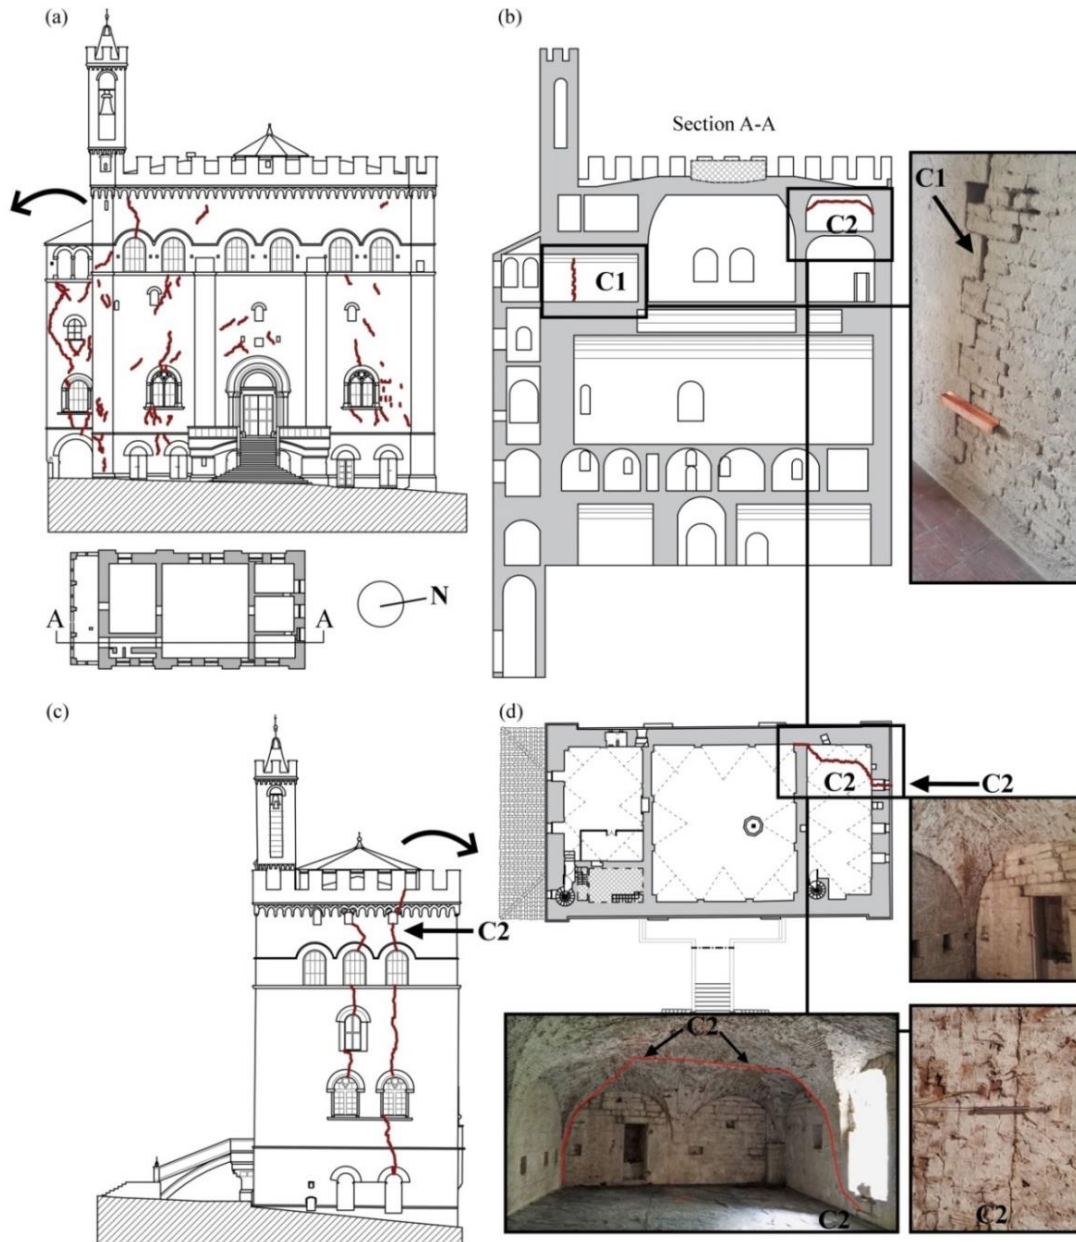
Structural damage of Consoli Palace: cracks of the East façade showing the possible overturning mechanism of the loggia towards South (a), section A-A of the Palace showing the 1st and the 2nd major cracks, namely C1 and C2, respectively (b), cracks present in the North façade of the Palace where the 2nd major crack C2 is highlighted (c) and plan view of the floor where C2 is present below the vaulted ceiling.
